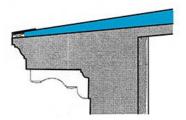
Sample installation of rigid foam insulation, tapered at the edge to avoid altering the appearance of the roof.
